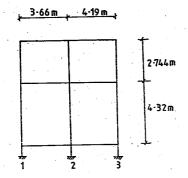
Cross section of Vierendeel foundation used for private house at Rajagiriya
